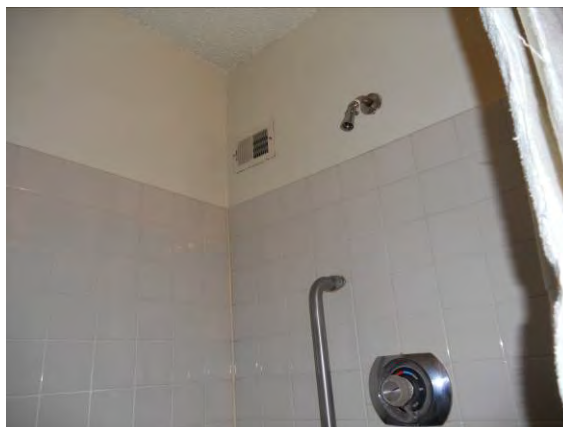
ADA unit with roll-in shower but no hand-held shower head
